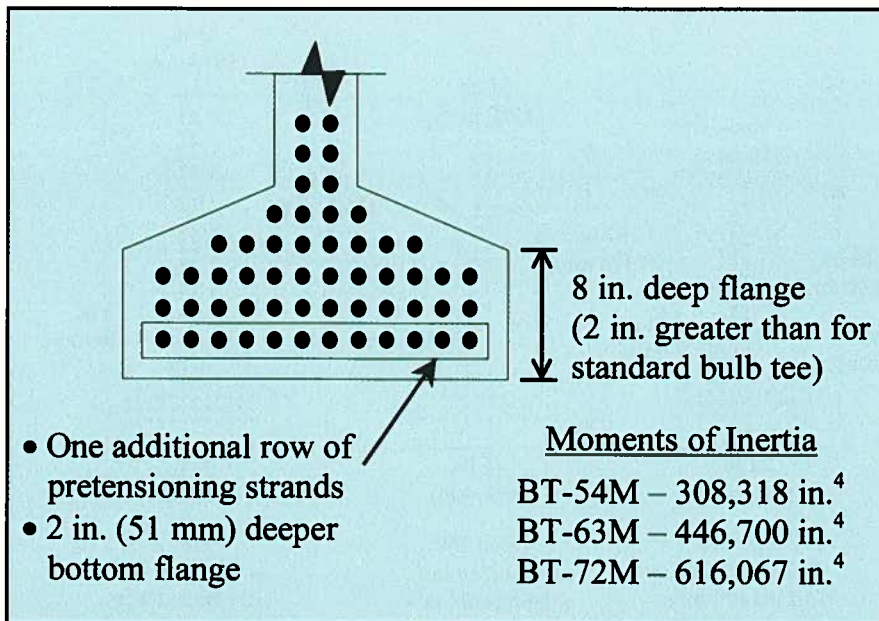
Detail of a modified AASHTO-PCI bulb tee, illustrating the 2 in. (51 mm) deeper bottom flange and the additional row of prestressing strands.
